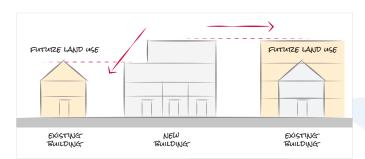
While considering future land use, stepping down building height can provide a sensitive transition in scale to adjacent buildings (2.1.2 a).
